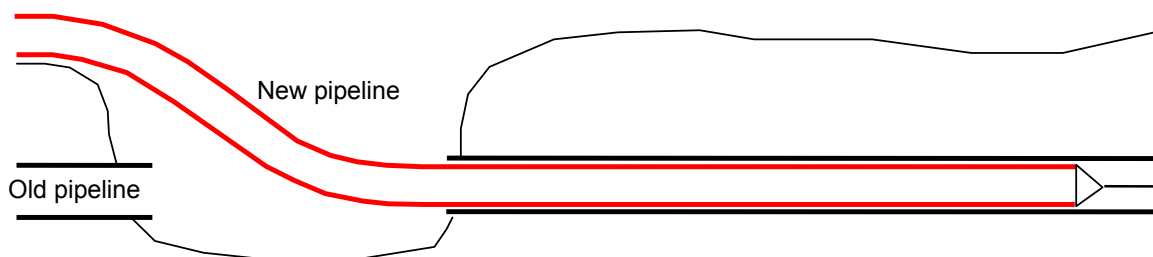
Sketch of a method where polyethylene pipes are welded together and dragged into a pipeline.
